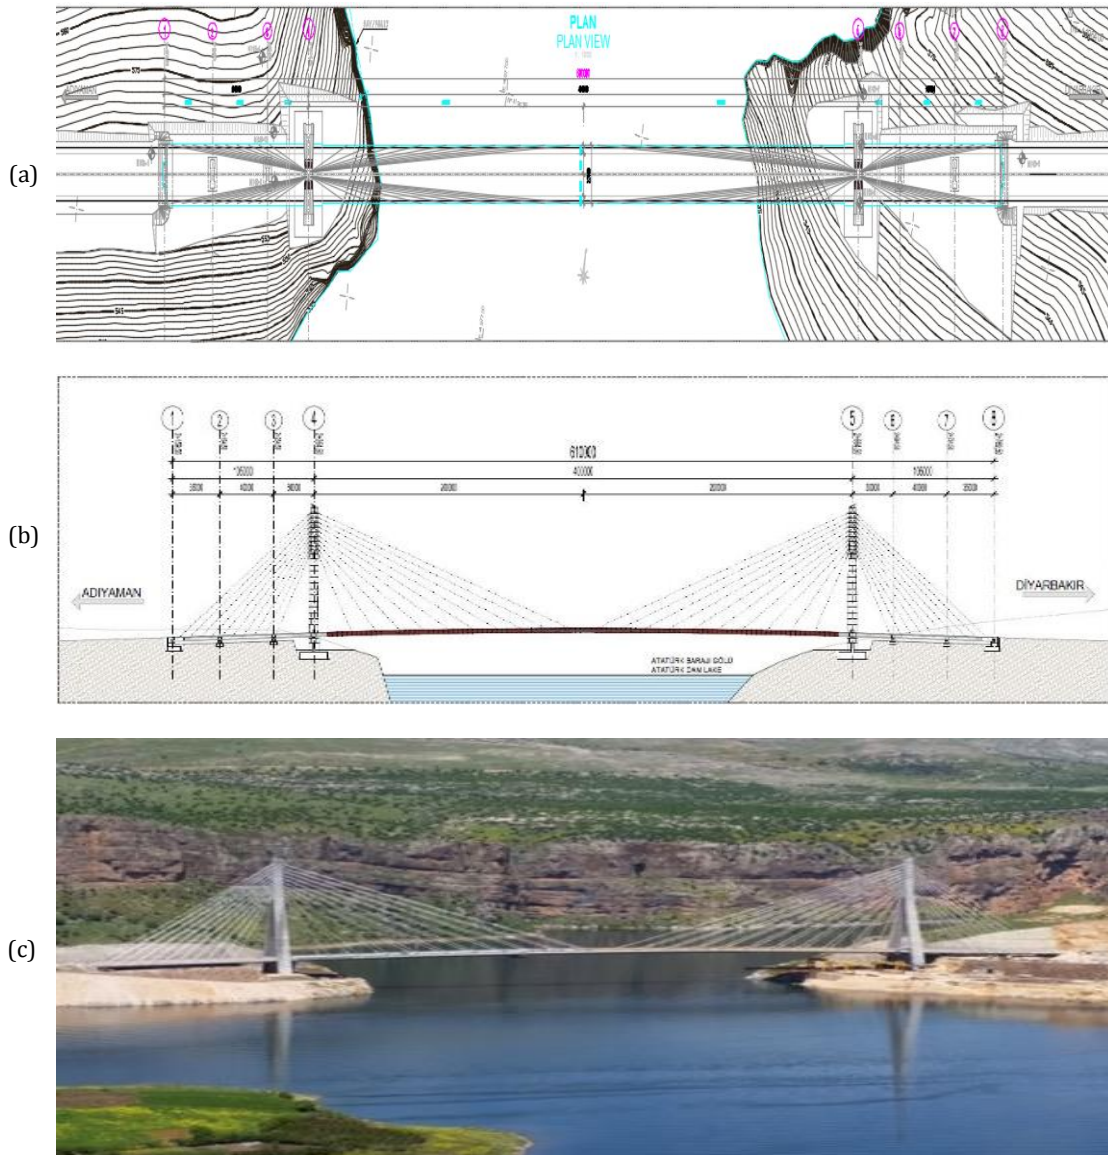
(a) Plan; (b) longitudinal section; and (c) view from Nissibi Bridge (NBP, 2012; NBR, 2015).
